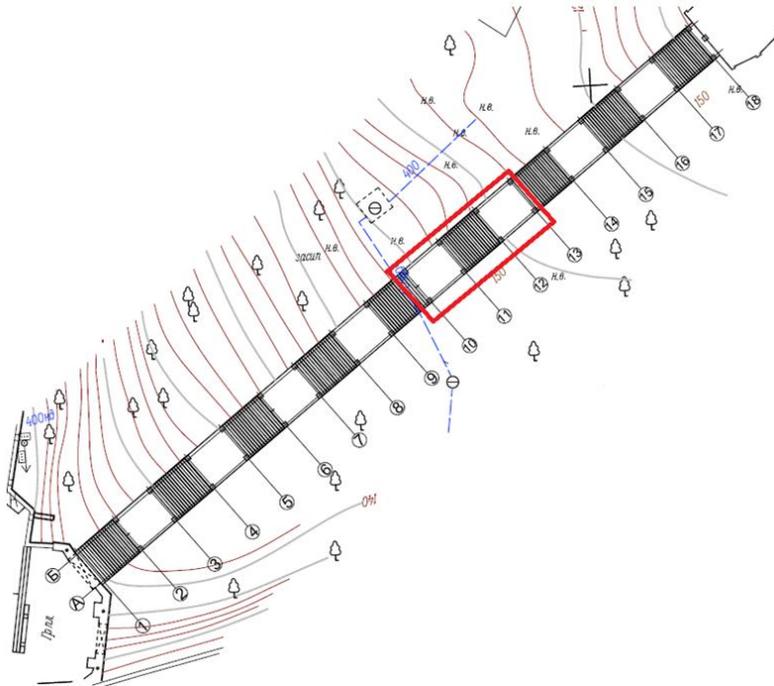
Layout of the stairs to the Magdeburg Law Monument with highlighted areas requiring foundation reinforcement [21]
